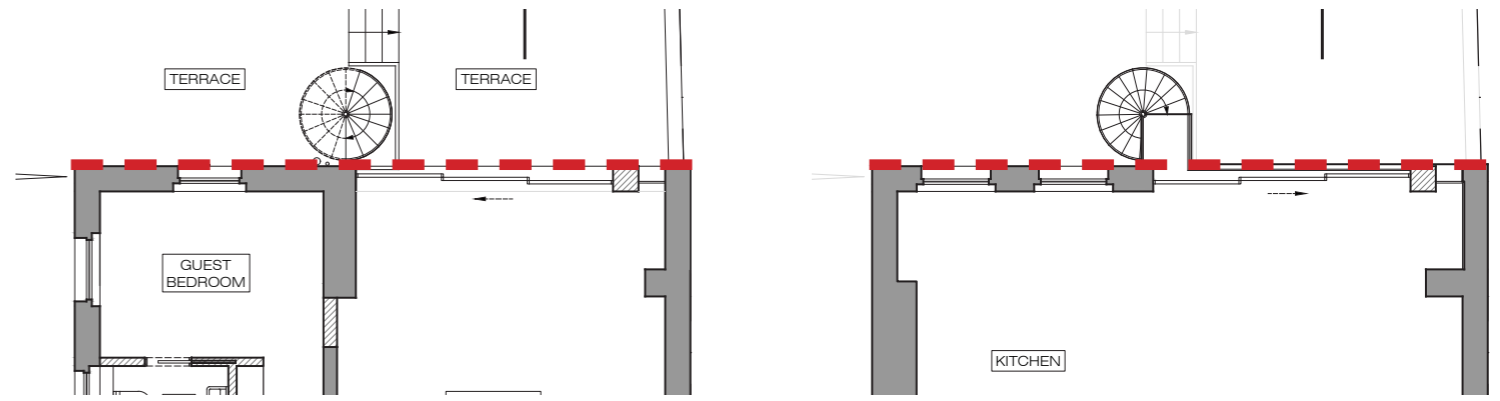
Lower ground and ground floor infill extensions aligning with the projection of the existing building
